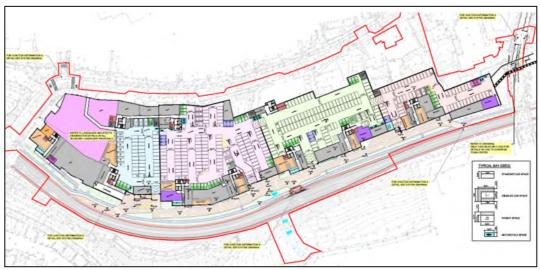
Proposed Lower Ground Floor Parking Provision
